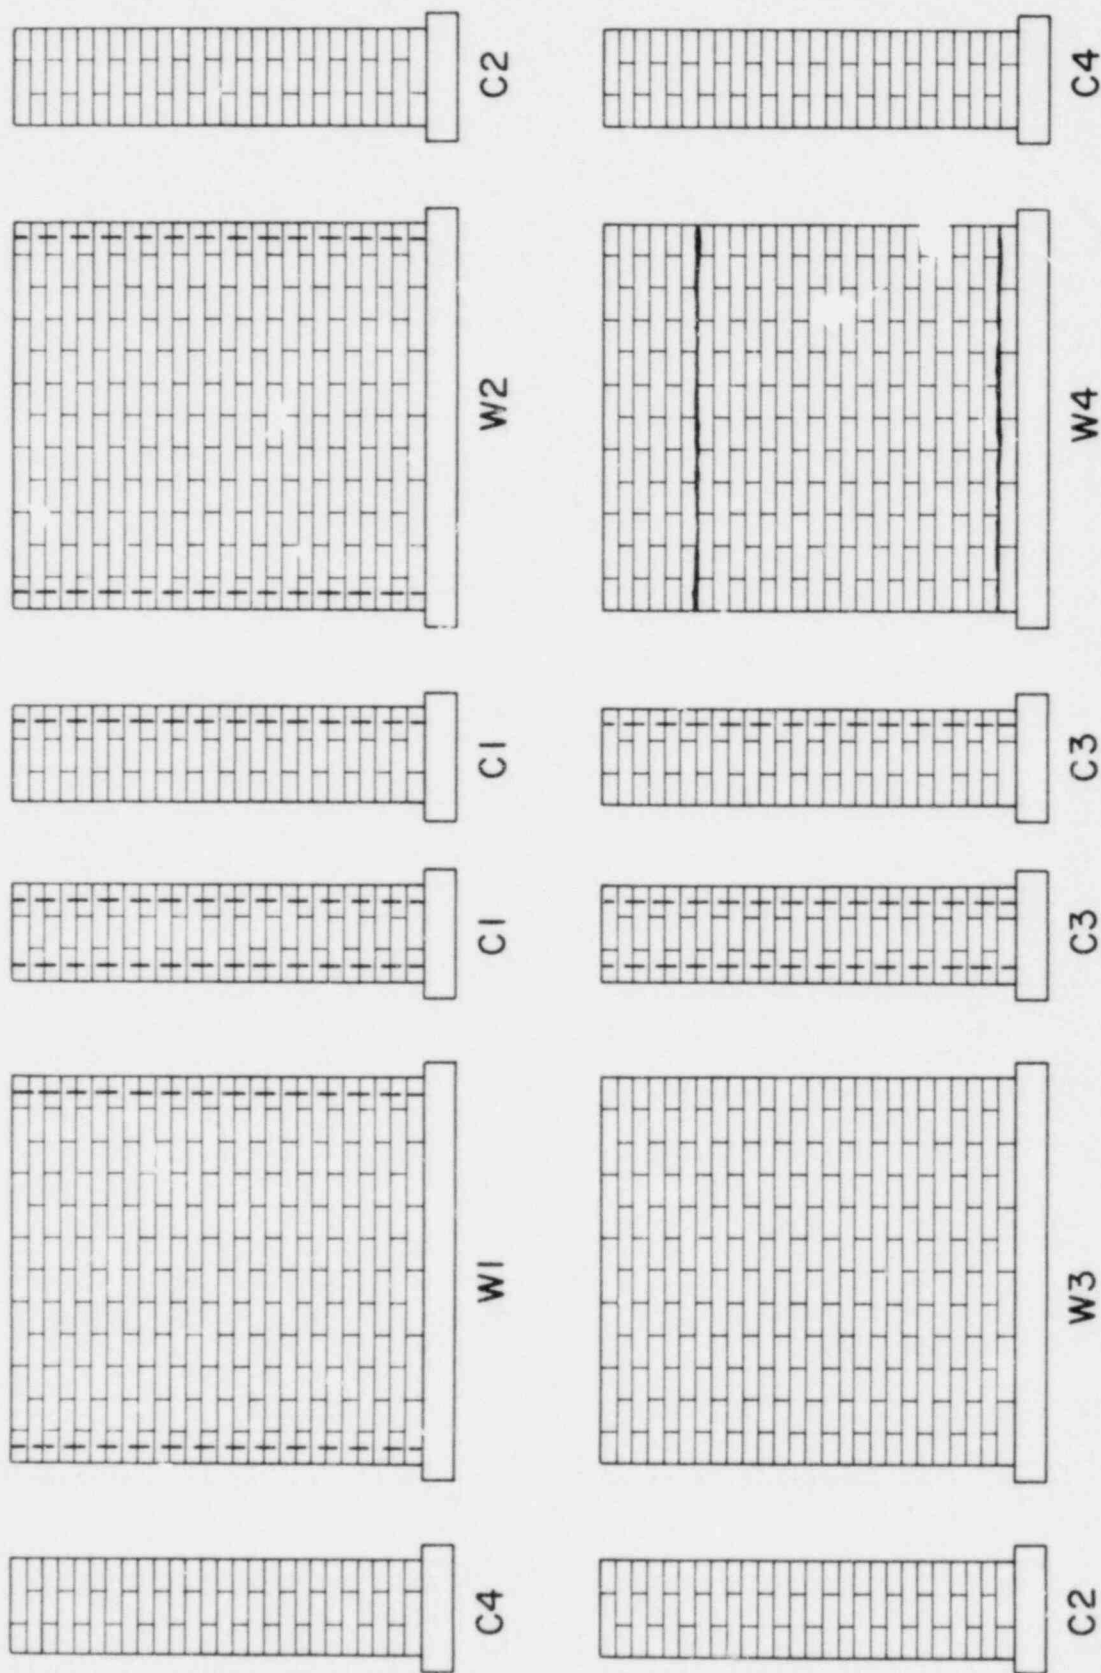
(f) DISTRIBUTION OF CRACKS IN THE MASONRY COMPONENTS: HOUSE -, AFTER TEST 20
